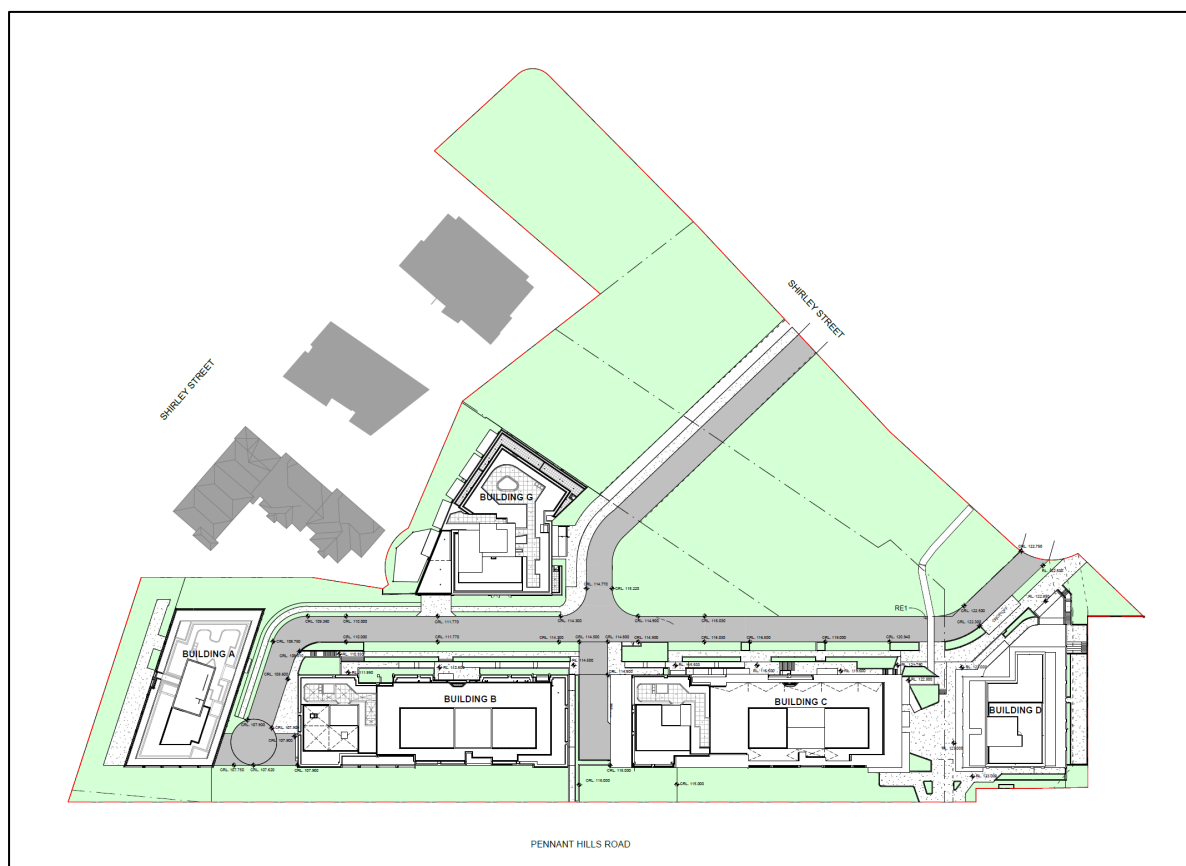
Subject Site Plan (Source: Crone Architects, Site Plan, CP-DA-A-1-0-0008, 30 April 2025)
